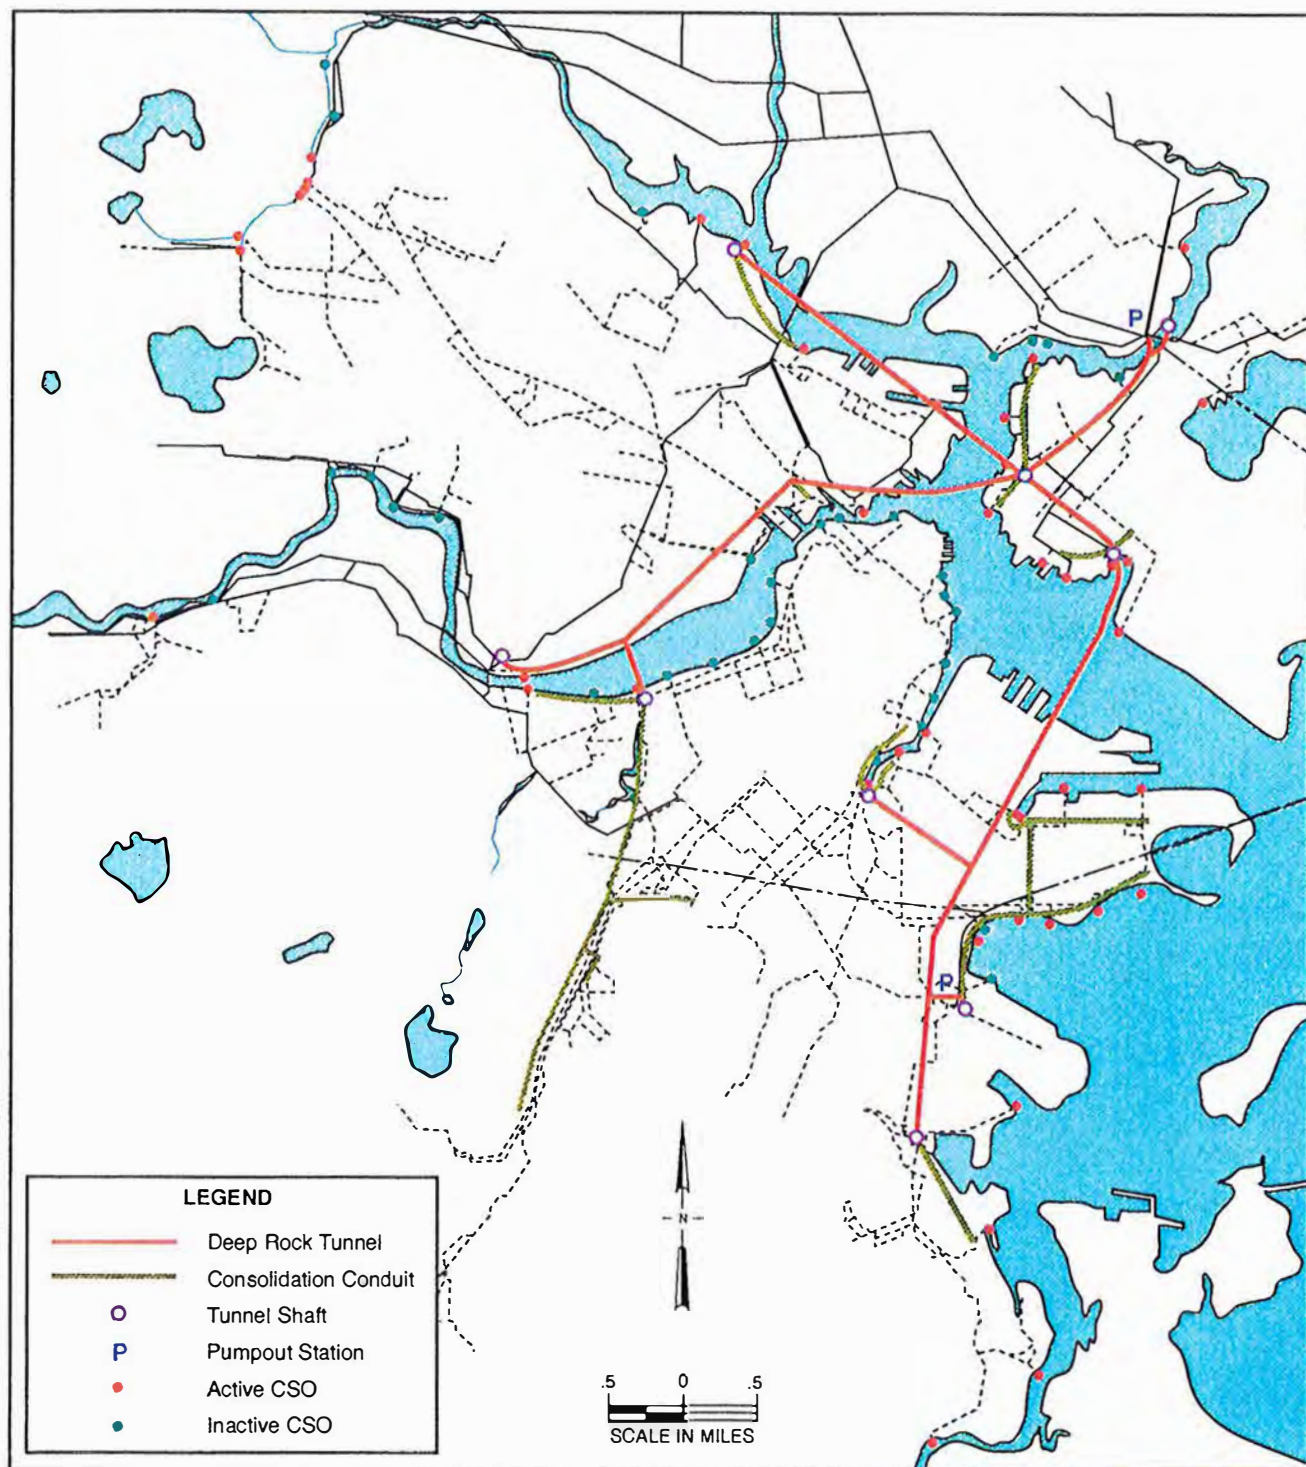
CSO TUNNEL PLAN FOR 3-MONTH STORM
